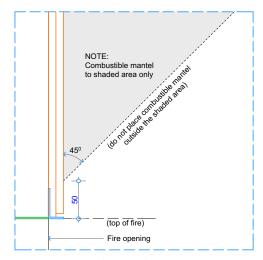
Cross Section Fire Surround Opt. 9 Concrete Cavity
